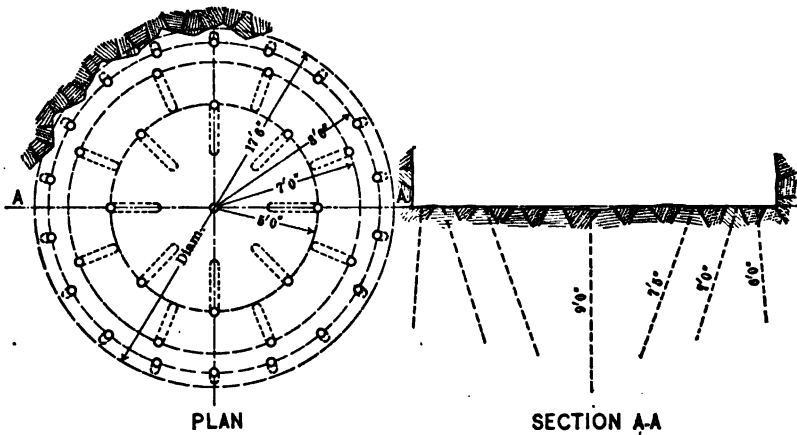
Contract 65. Arrangement of Drill Holes for Sinking Shaft 8.
